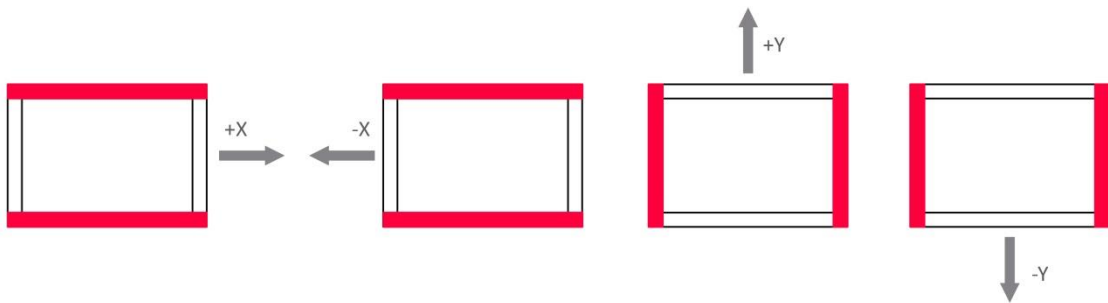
2: Walls to consider according to the loading direction evaluated (plan view)
